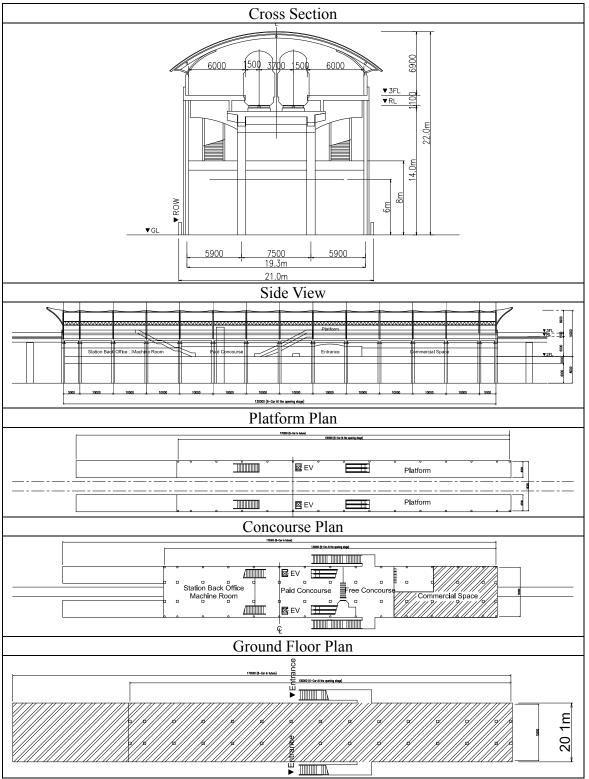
Station Plan (Elevated Island, Elevated Concourse)
